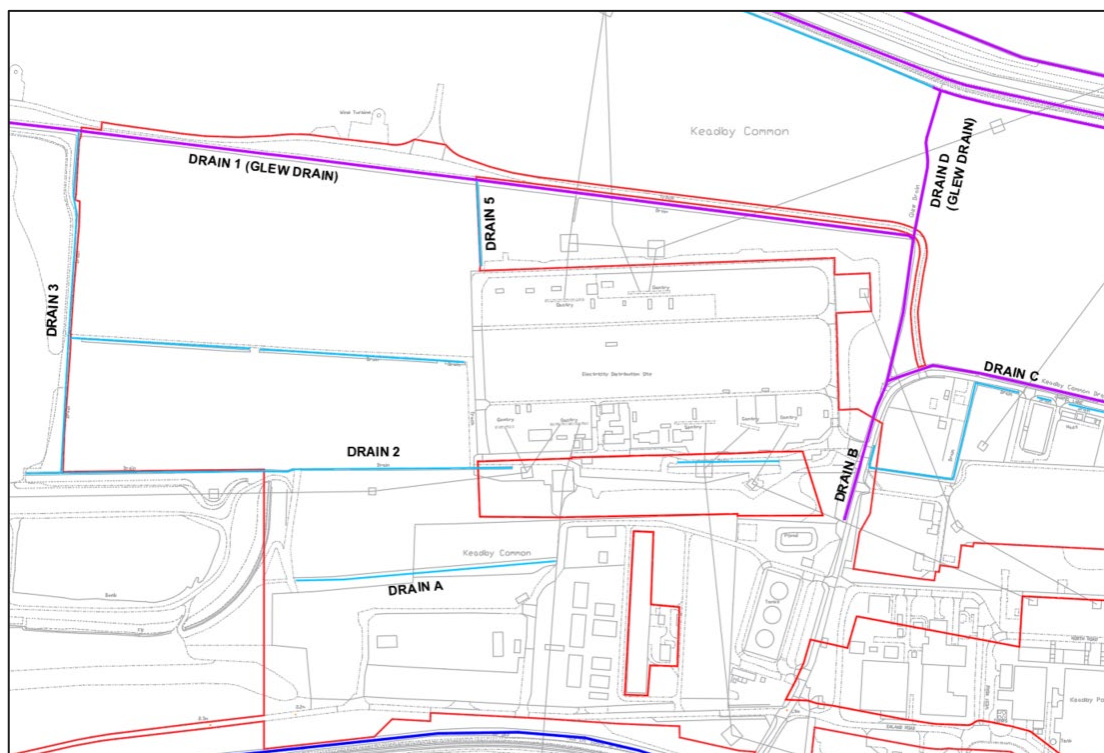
A.3 Existing land drains in and around the Site (Extract from the Outline Drainage Strategy Plate 4-1 (Annex 3))
